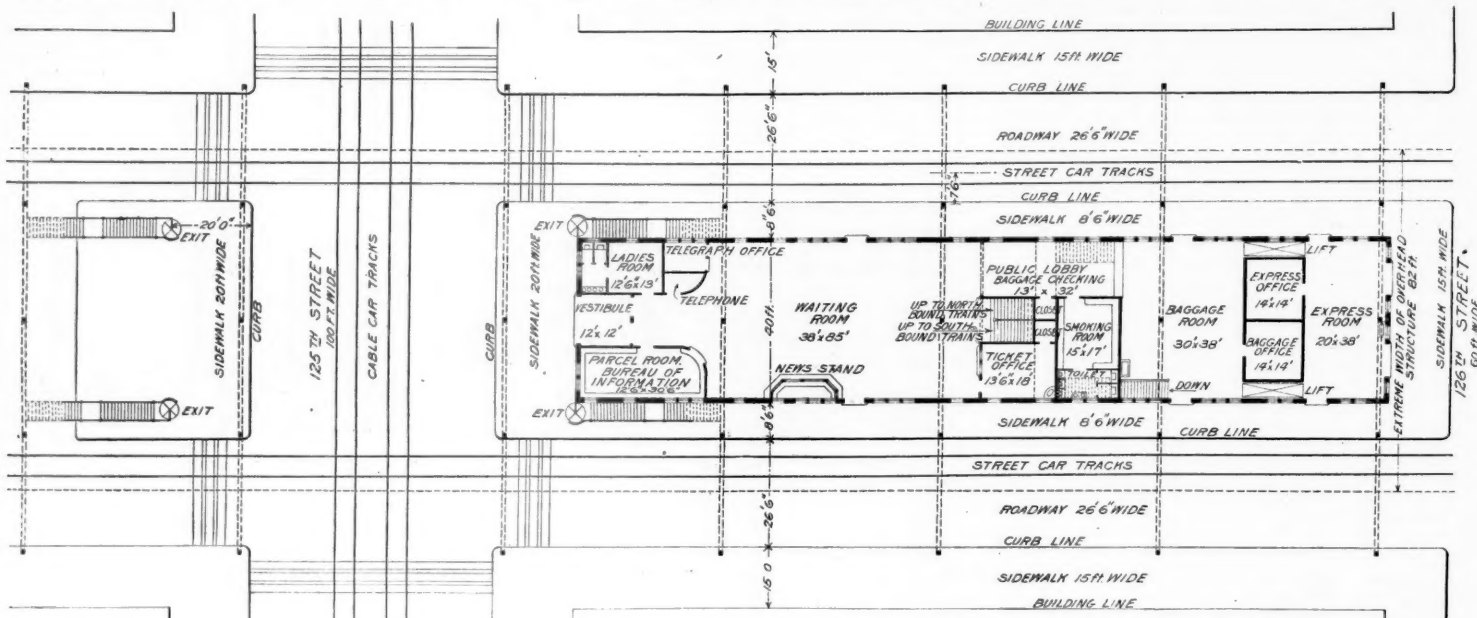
Plan of Station at 125th Street, New York—New York Central & Hudson River Railroad.
